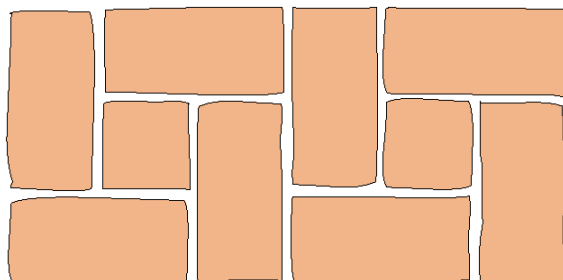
Plan view showing 'half batts' in the centre of the wall.
